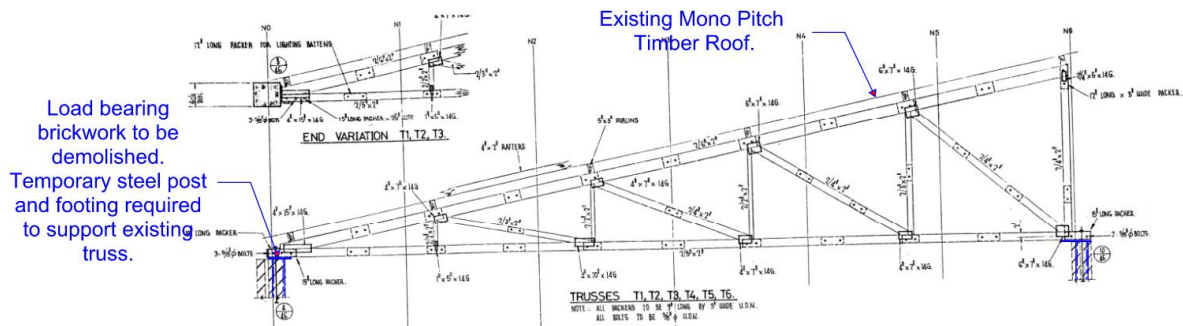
Typical section of existing structure, at the link between stage 1 and 2.
